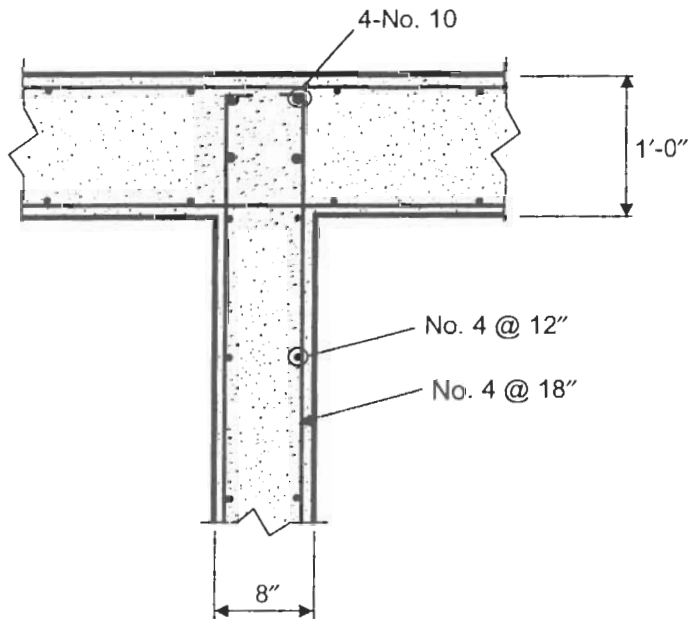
Reinforcement Details for Shear Wall Along Line 4 (SDC A)
